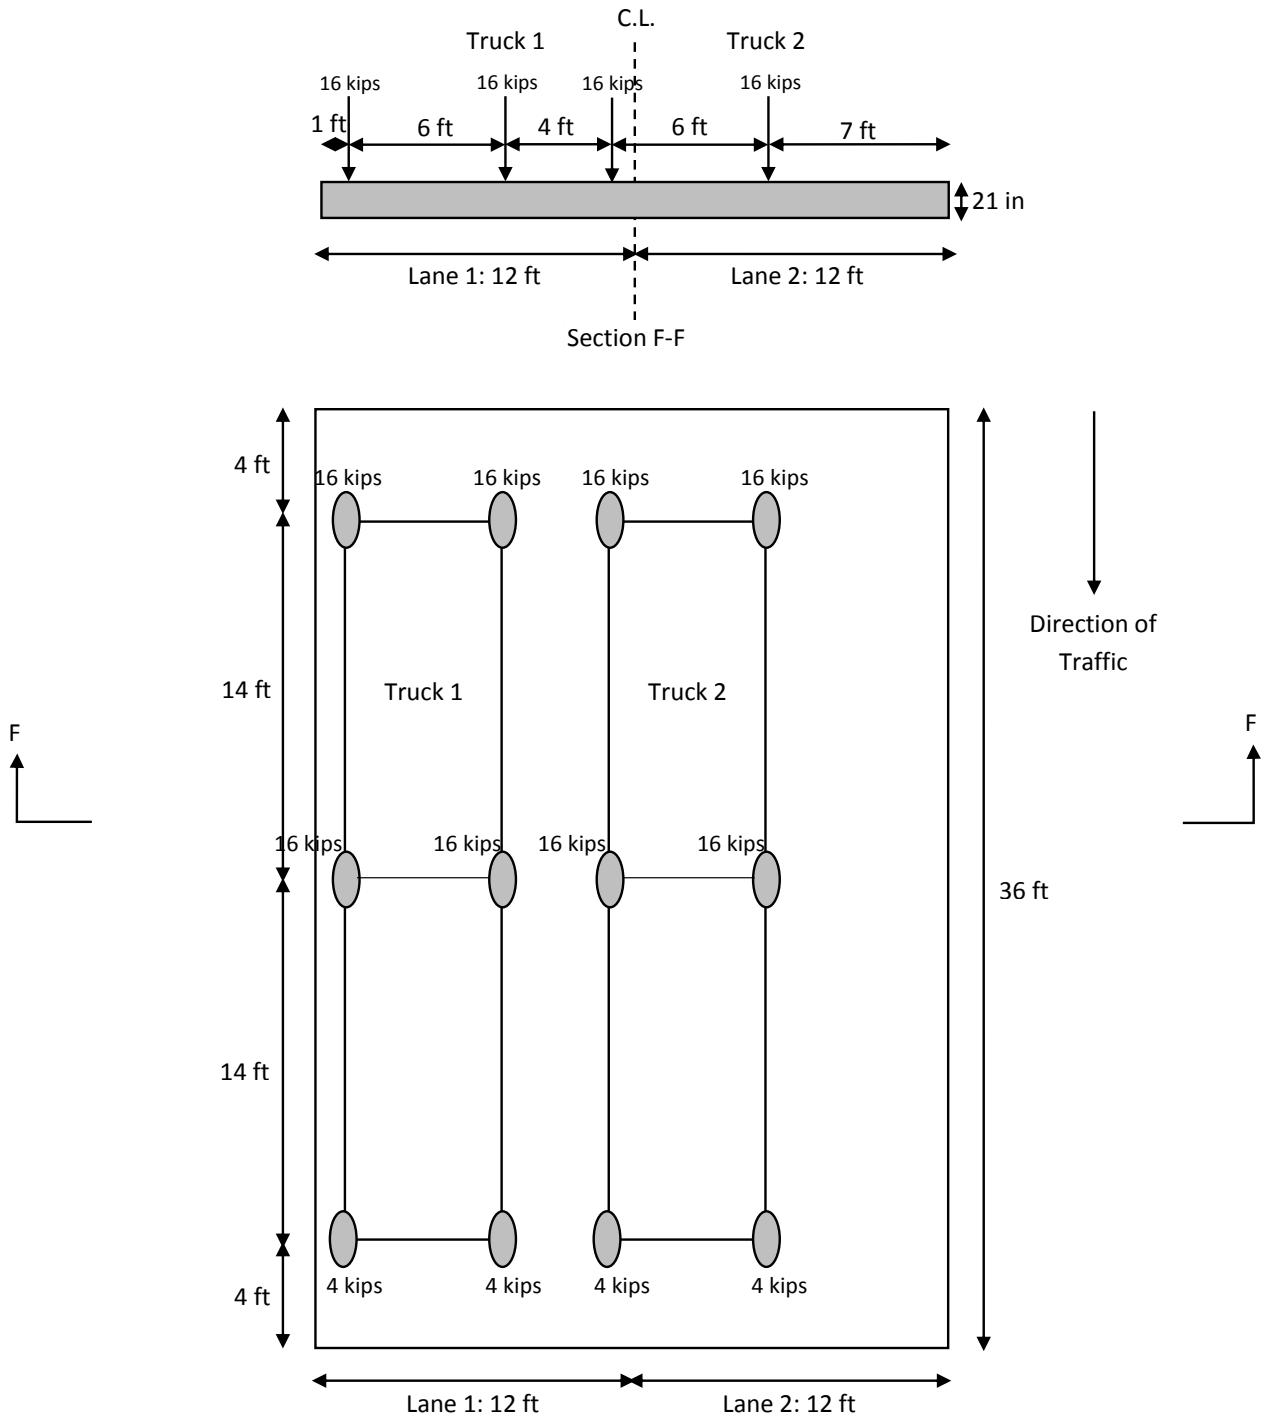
Typical Cross-Section and Plan of a Two-Lane 36 ft Span Straight Bridge with No Railings under Edge Loading E1.
